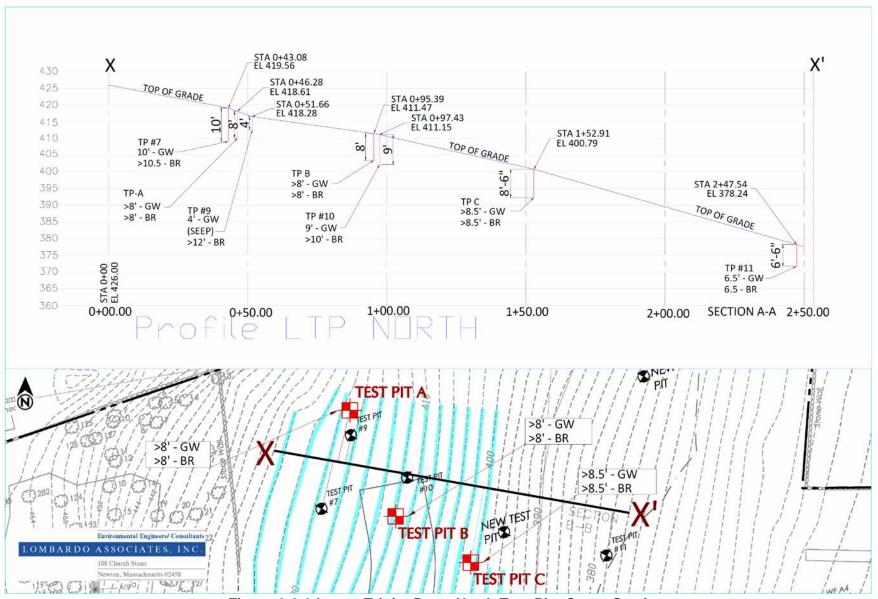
Lower Trinity Pass, North Test Pits Cross-Section
